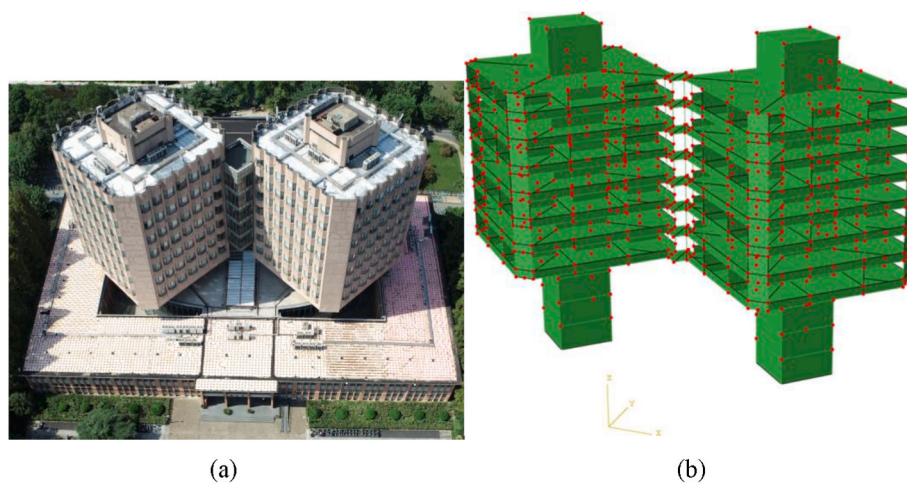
The eleven-story reinforced concrete irregular structure. (a) Shows the photo of the eleven-story reinforced concrete irregular structure; (b) shows the finite element model of the eleven-story reinforced concrete irregular structure and selected nodes.
